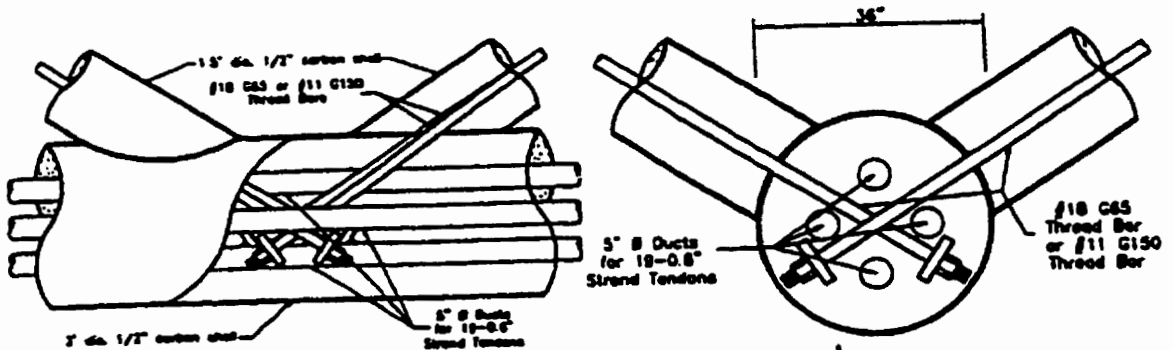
Details of connections in space truss carbon shell bridge systems [Seible 1996]
